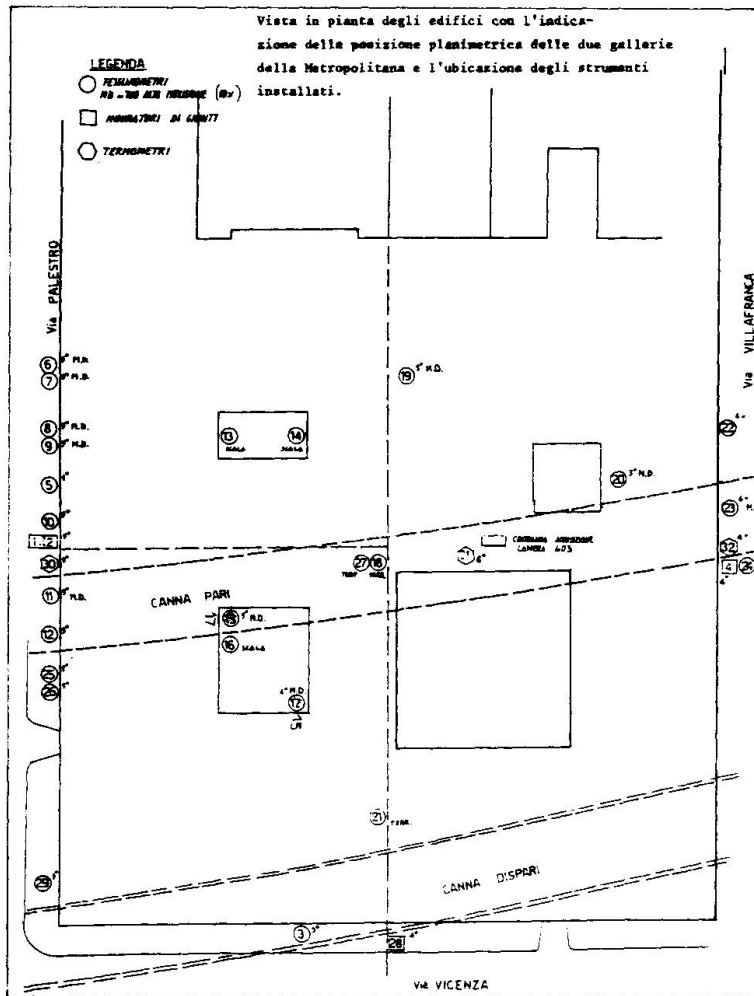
Plan view of the buildings with the indication of the two underground tunnels position and of the instrument location.
